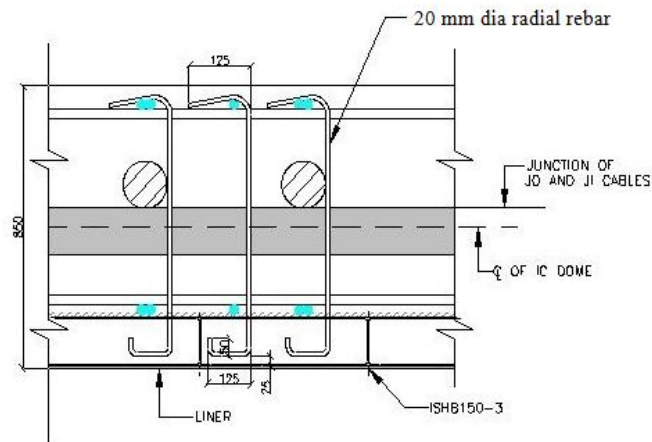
Arrangement of radial reinforcement at a typical liner backing member-concrete interface
